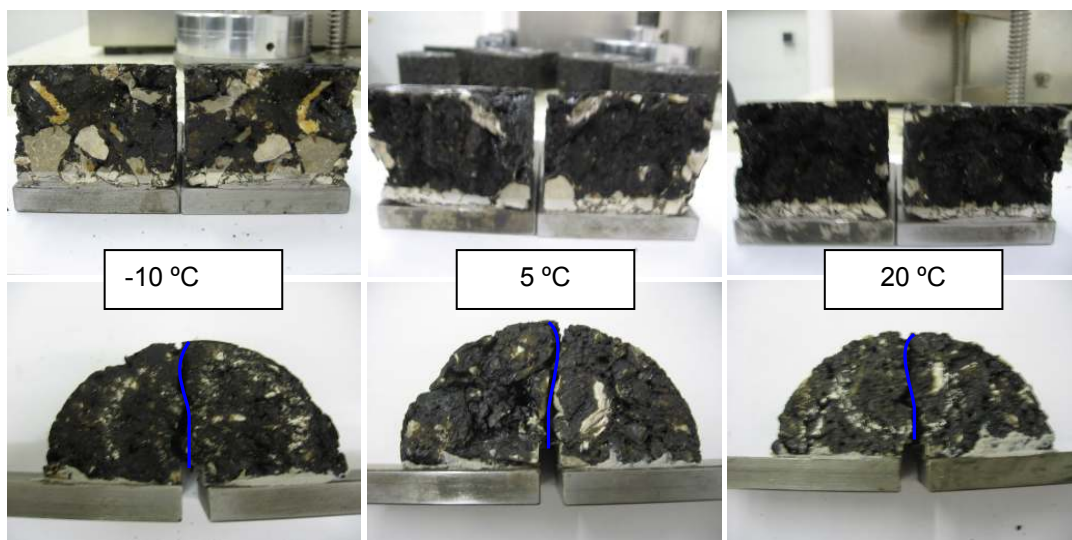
Typical fracture images for mixture G-20 at different test temperatures (top images: view of fracture surface, bottom images: view of crack propagation).
